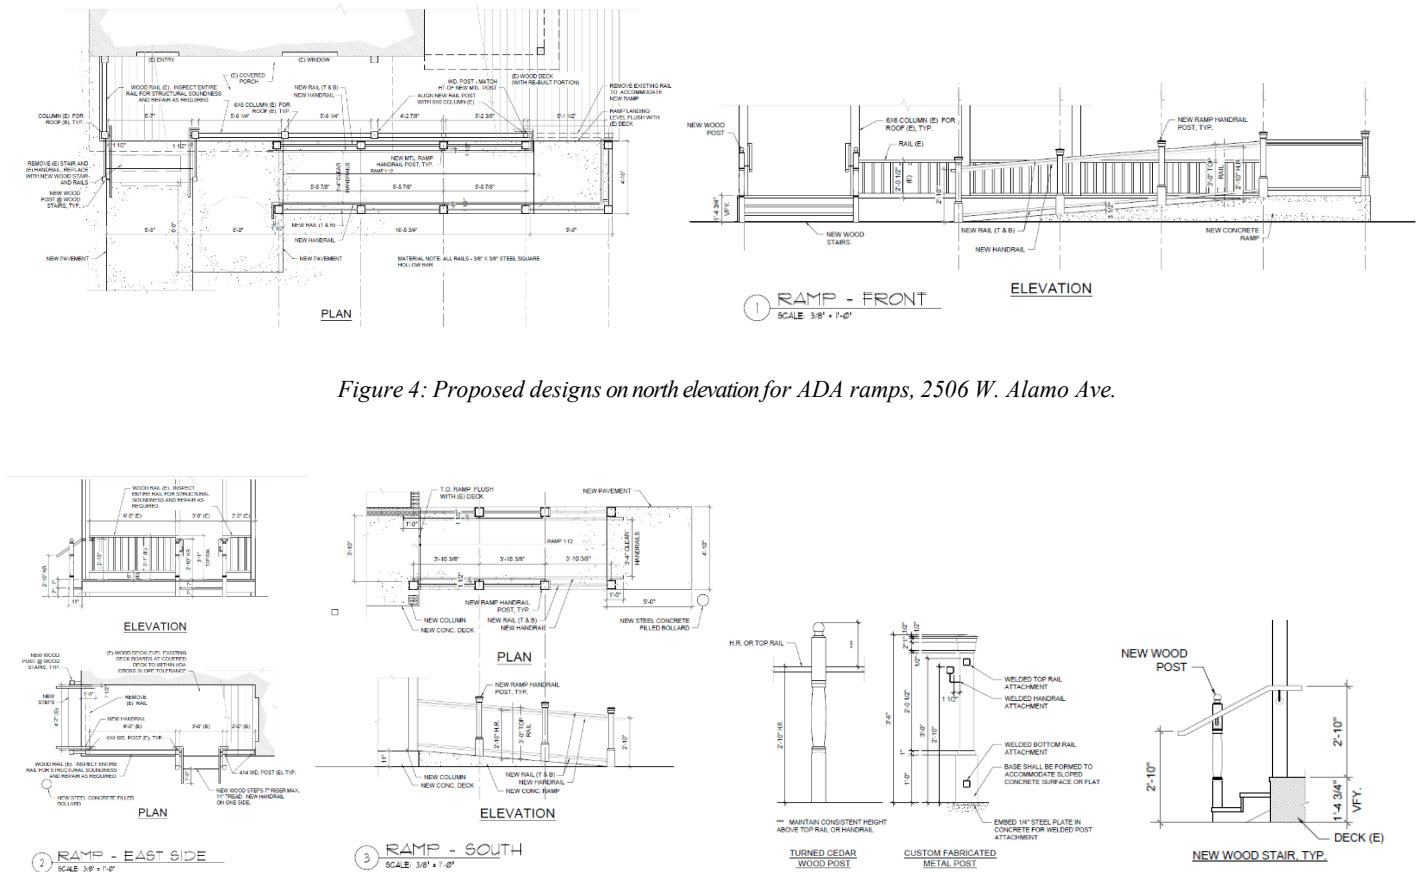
Proposed designs on north elevation for ADA ramps, 2506 W. Alamo Ave.
